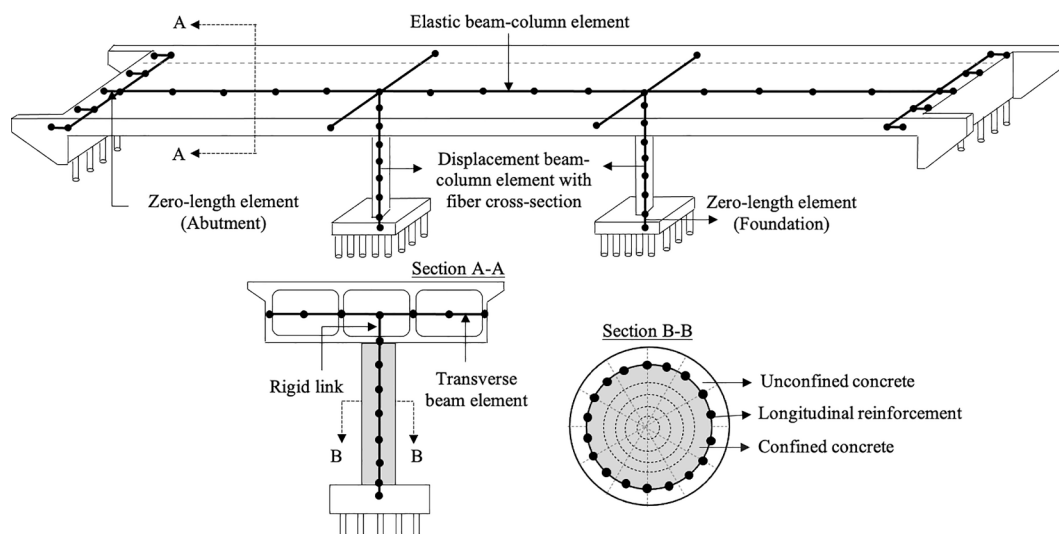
Schematic layout for the analytical modeling of a three-span box-girder concrete bridge.
